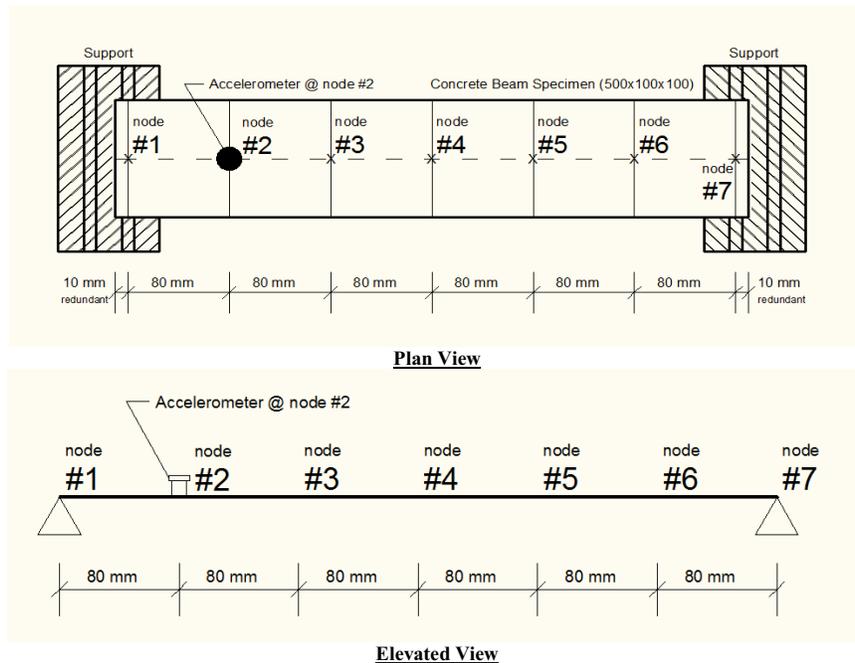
Depiction of Concrete-beam Specimens Setup with Labels during Modal Tests (Not to Scale)
